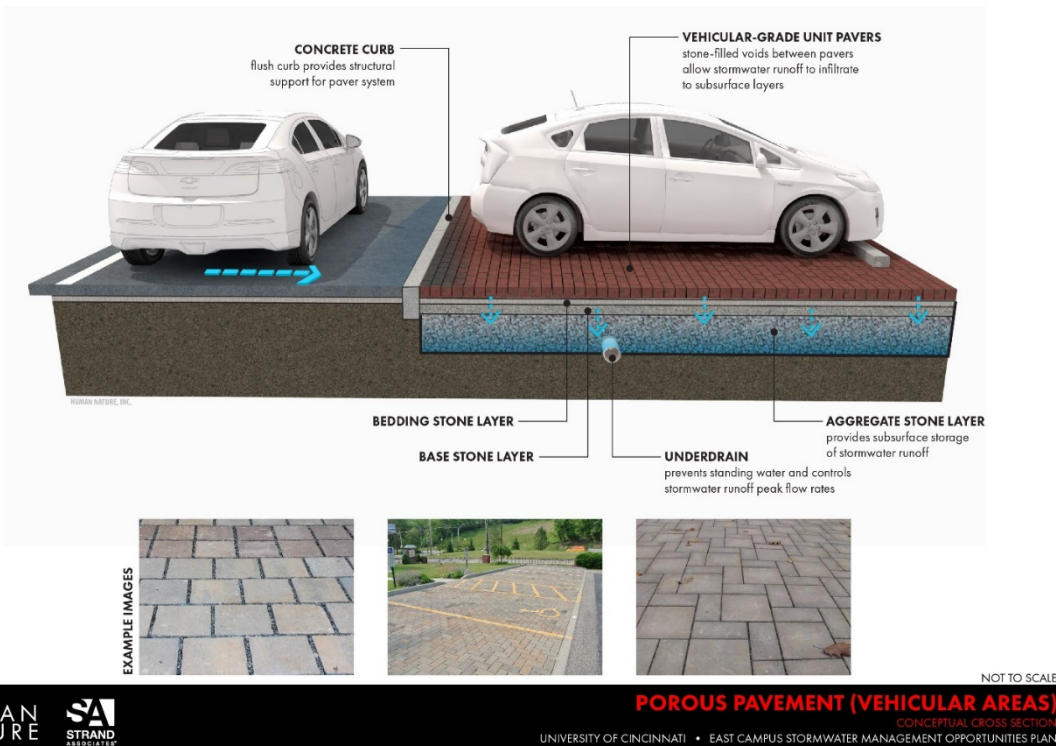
Example Conceptual Cross Section for Porous Pavement (Vehicular Areas)
